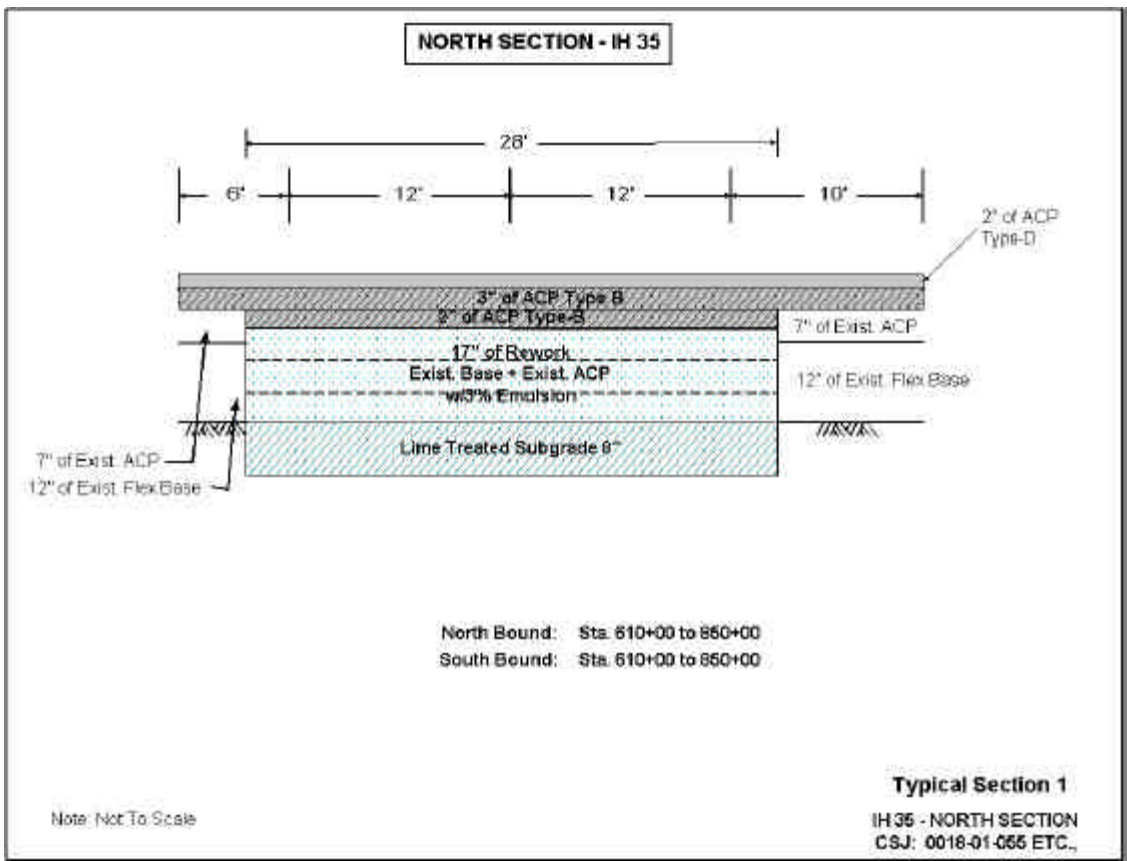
Proposed North Typical Section of IH 35 in Laredo District.
